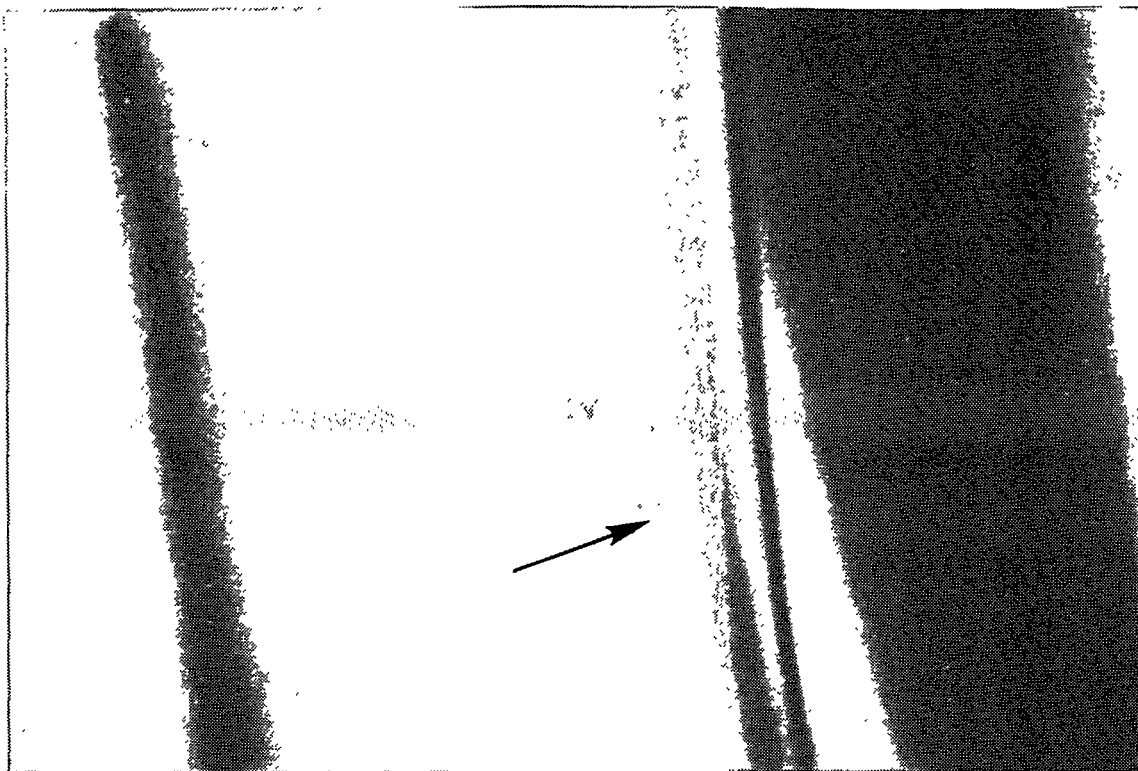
Test II-20. Specimen VL-1 Showing Posttest Cracks.
